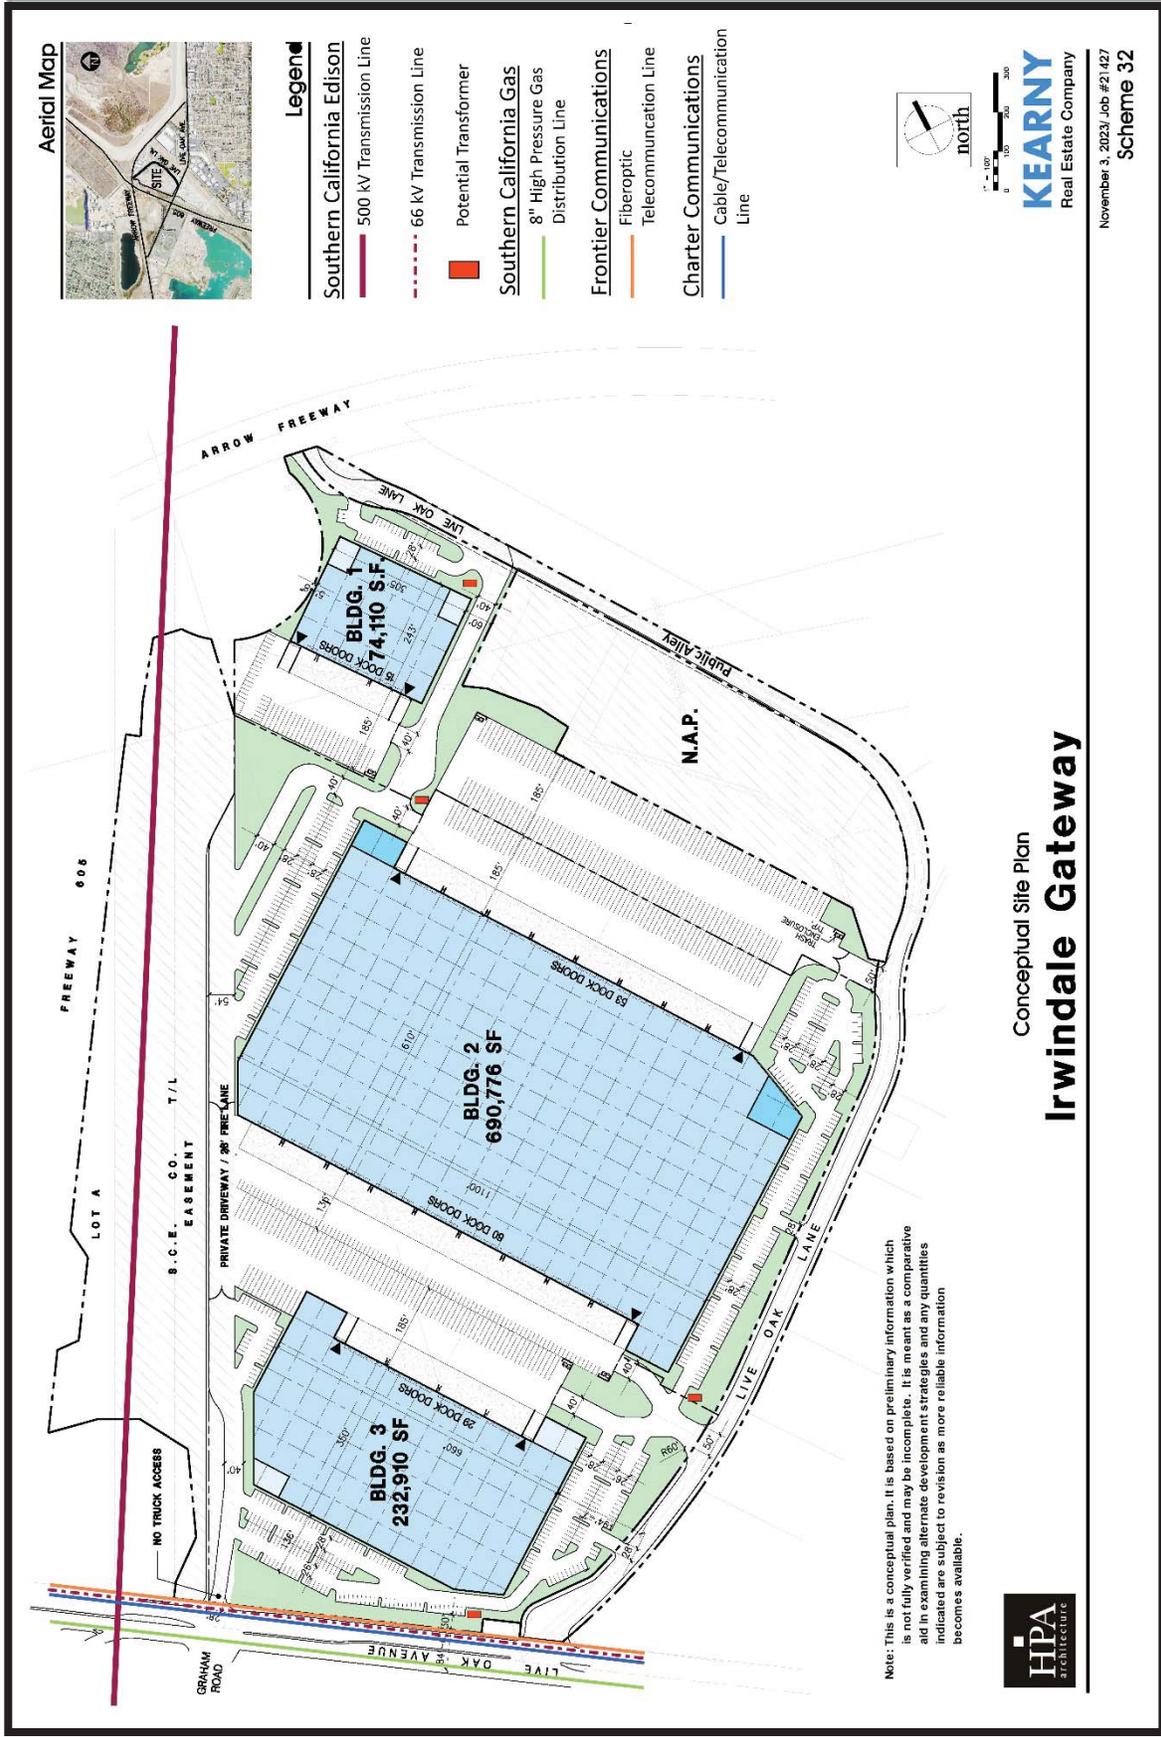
CONCEPTUAL DRY UTILITIES PLAN
